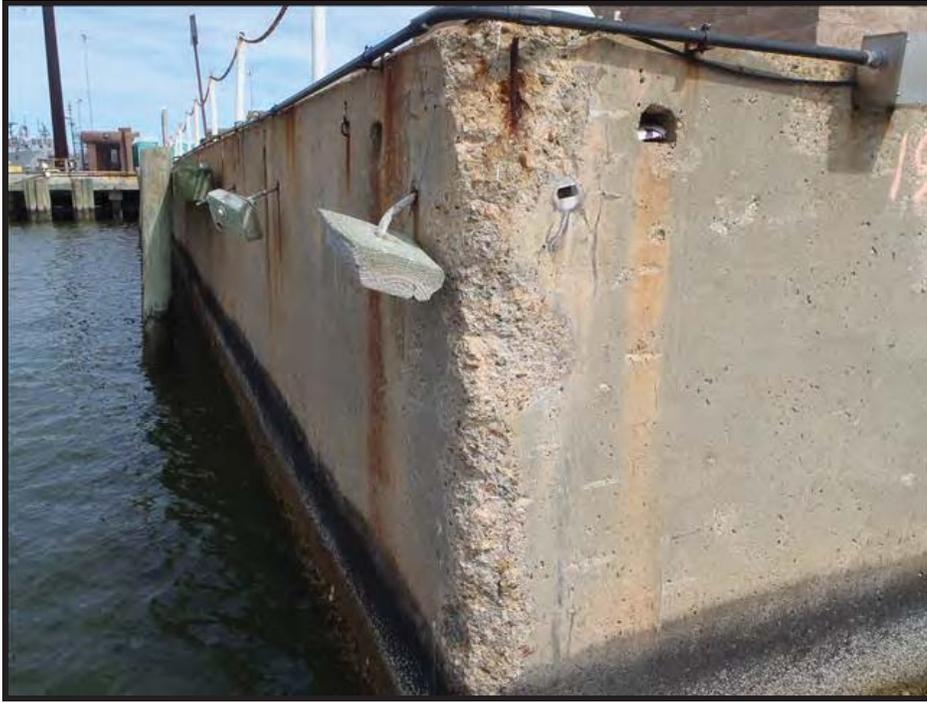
View of the open mechanical spall on the sheet pile cap, Sta. 9+09.
